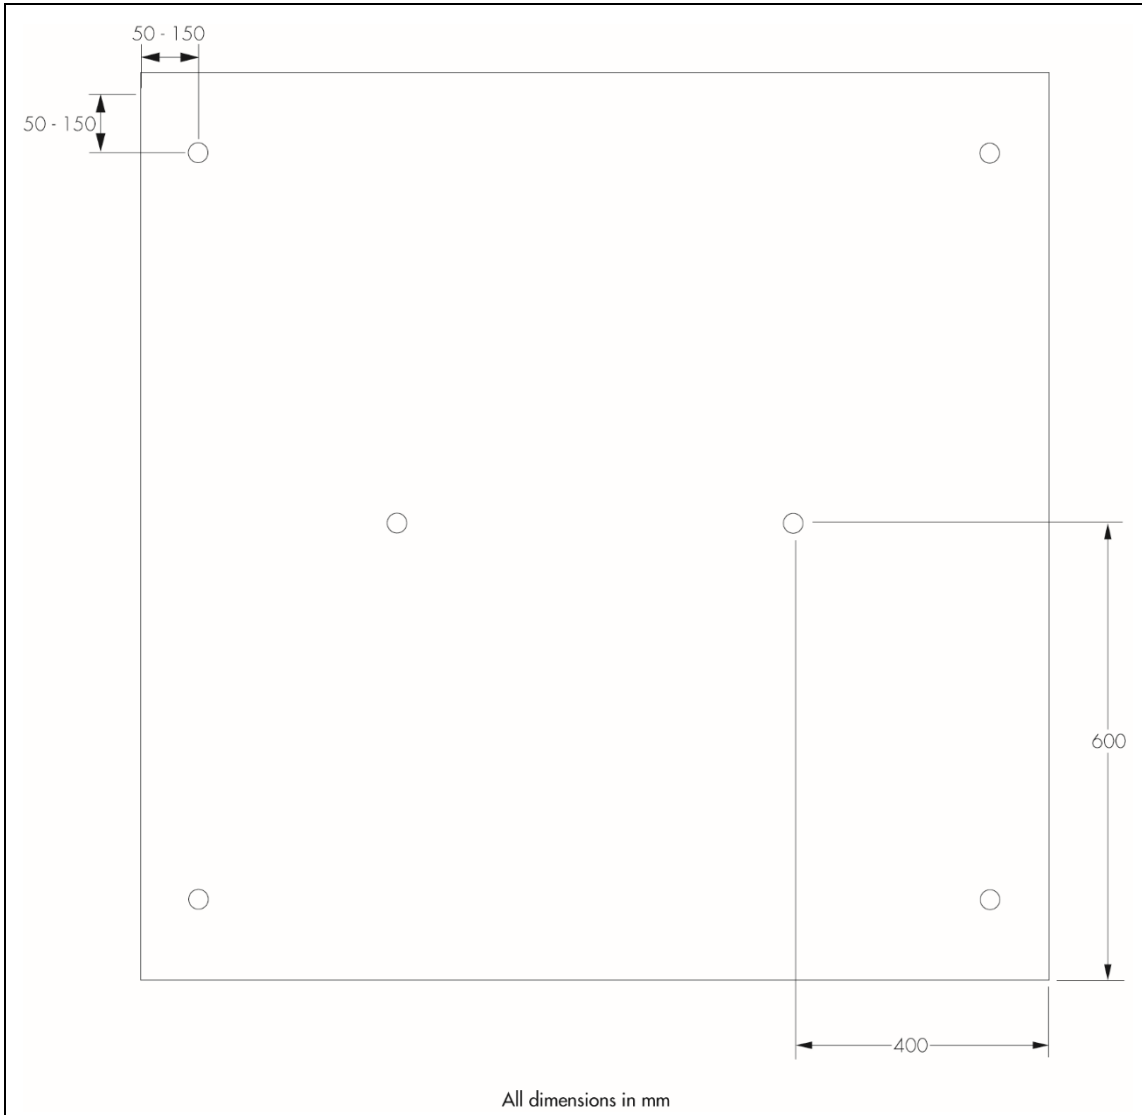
Fixing layout 2400 by 1200 mm board — minimum number of fixings
